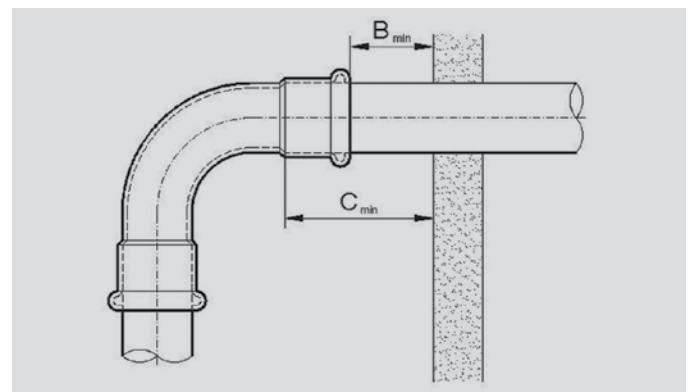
Minimum distance from wall/floor to front of press fitting (B) and socket end from wall (C) for sizes $d > 54$ mm (see Table 16)
